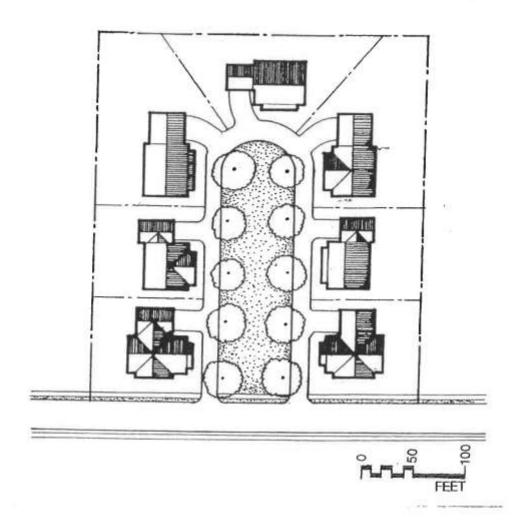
"Loop lanes": innovative street forms offer a practical alternative to the cul-de-sac in addition to providing neighborhood greenspace and an opportunity to install a "rain garden" capturing stormwater runoff close to the source.
